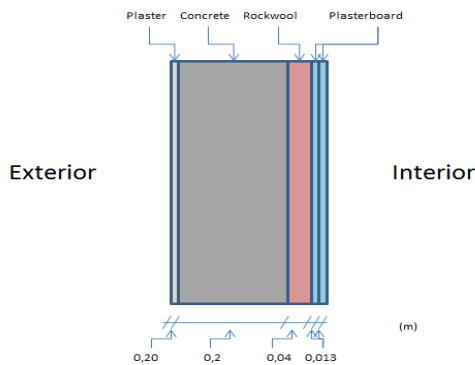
Office wall layers of Level 0, Travessa do Patrocínio
